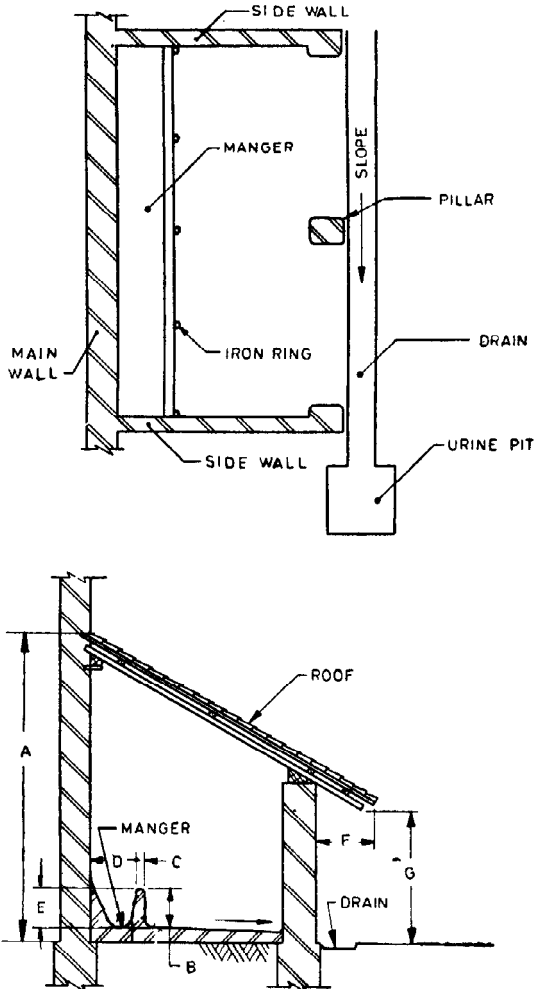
TYPICAL LAYOUT OF FARM CATTLE SHED
